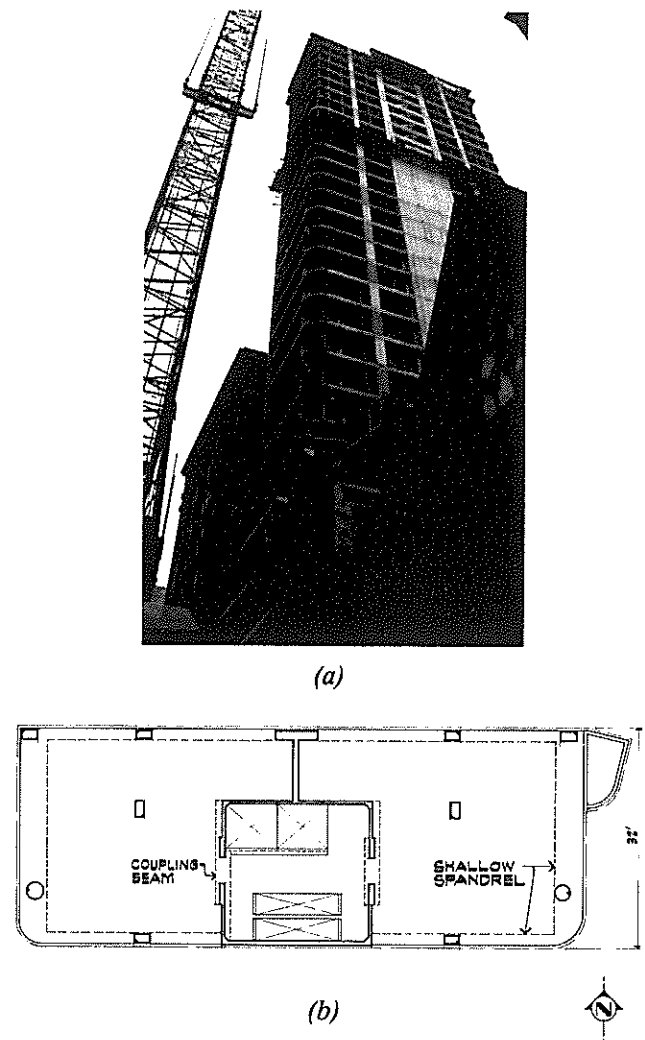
211 Madison Ave. (recipient of the Concrete Industry Board's 1984 Residential Award): (a) south elevation; (b) typical floor plan (Photo: G. Gwertsman)
